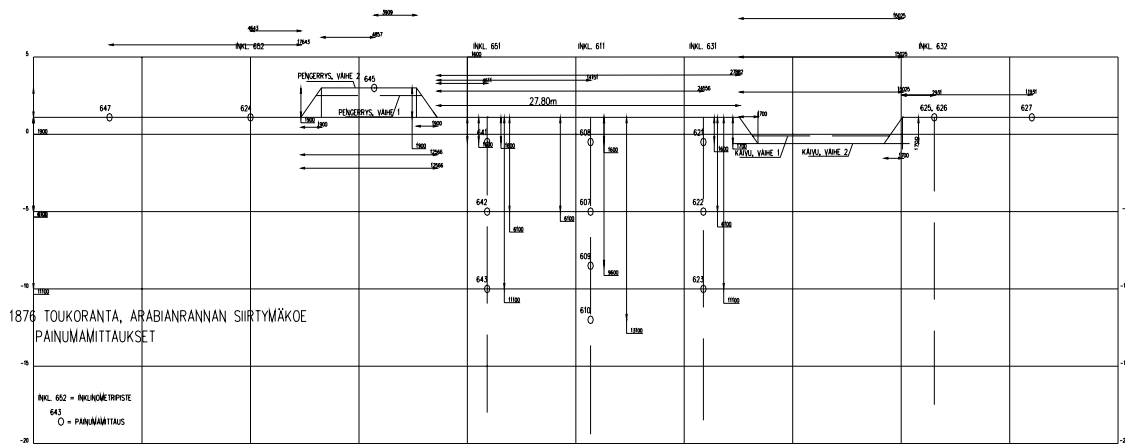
Cross-sectional profile of the test embankment and excavation (1996, Fundus)
